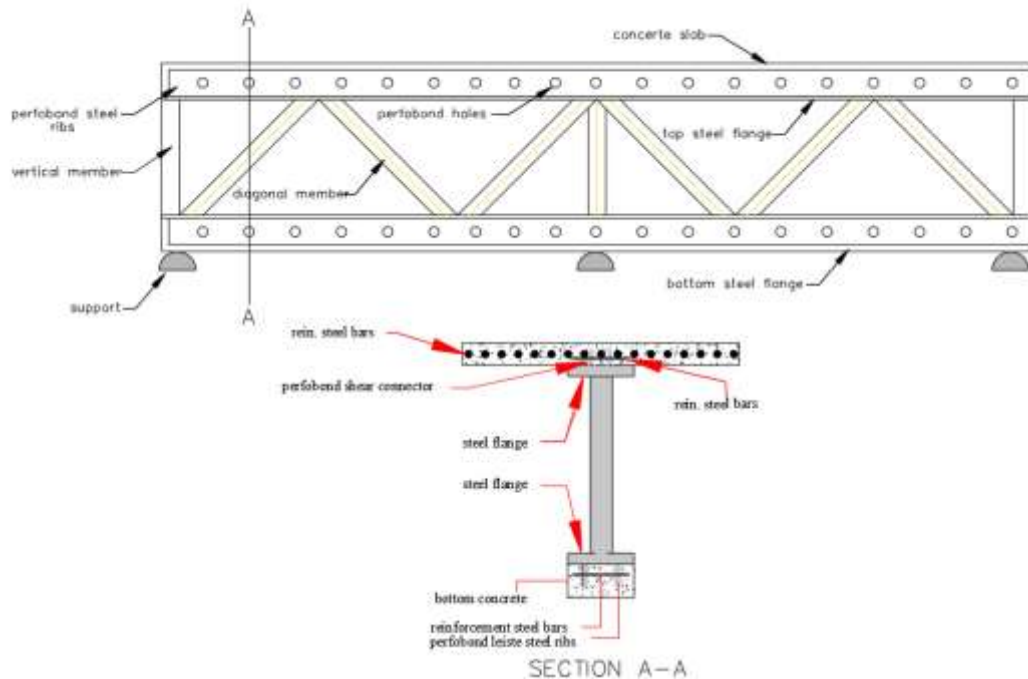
Typical Double Composite Truss Continuous Girder. (a) Girder Side View, (b) Composite Girder Cross- Section
